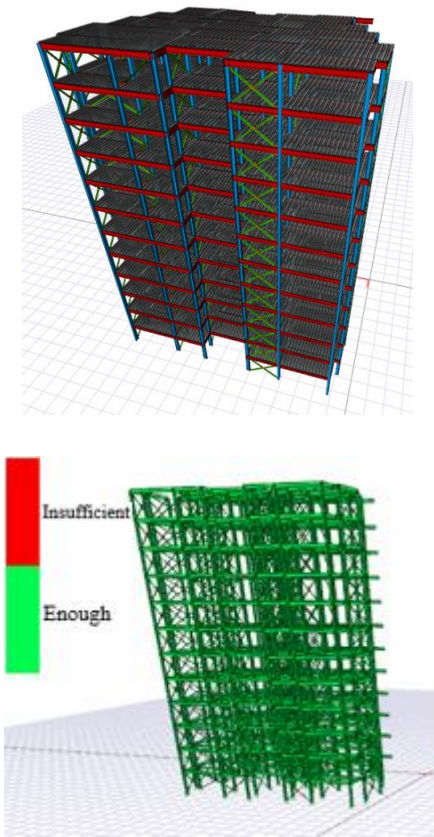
Elevation and Structural Design of the 12-Story Reinforced Concrete Building
